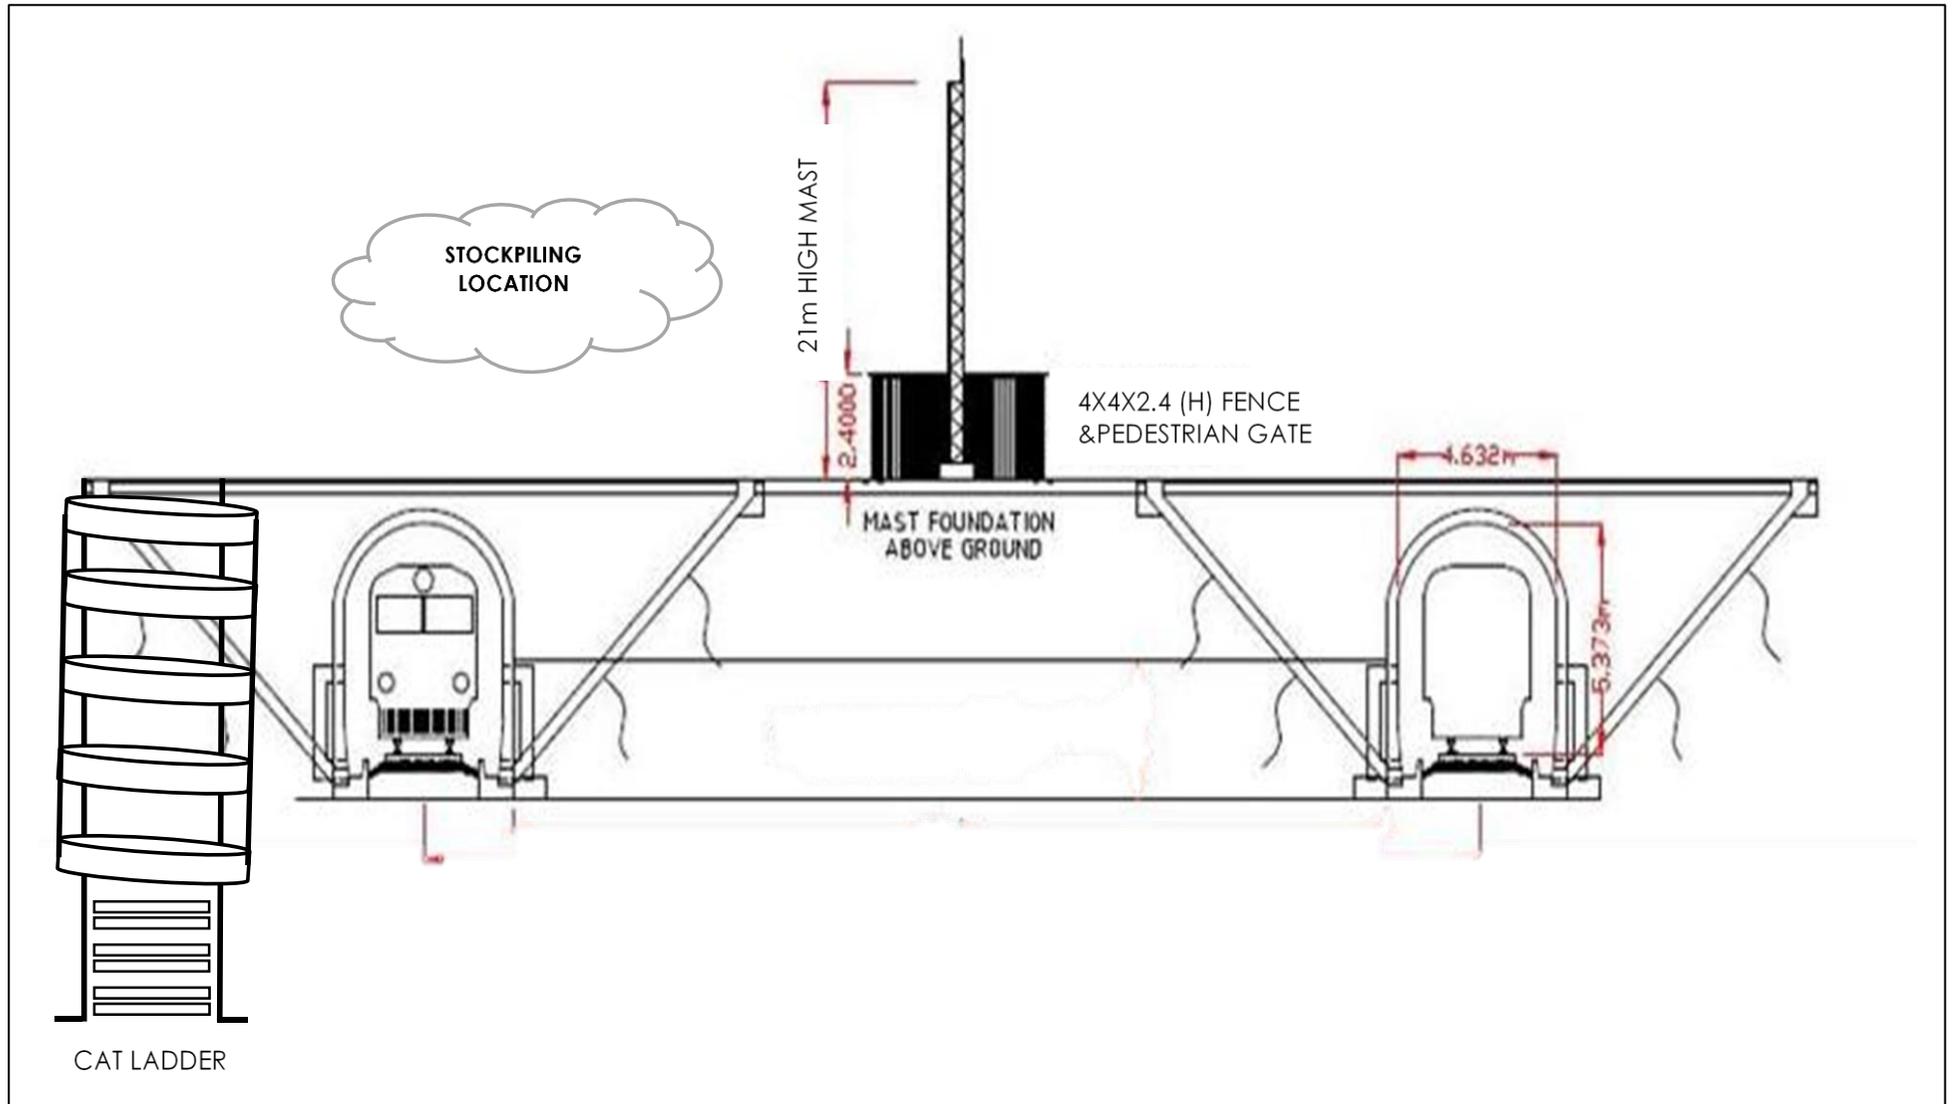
Site layout of the proposed radio high mast at Ashburton Tunnel No. 4 near Pietermaritzburg, KwaZulu-Natal
